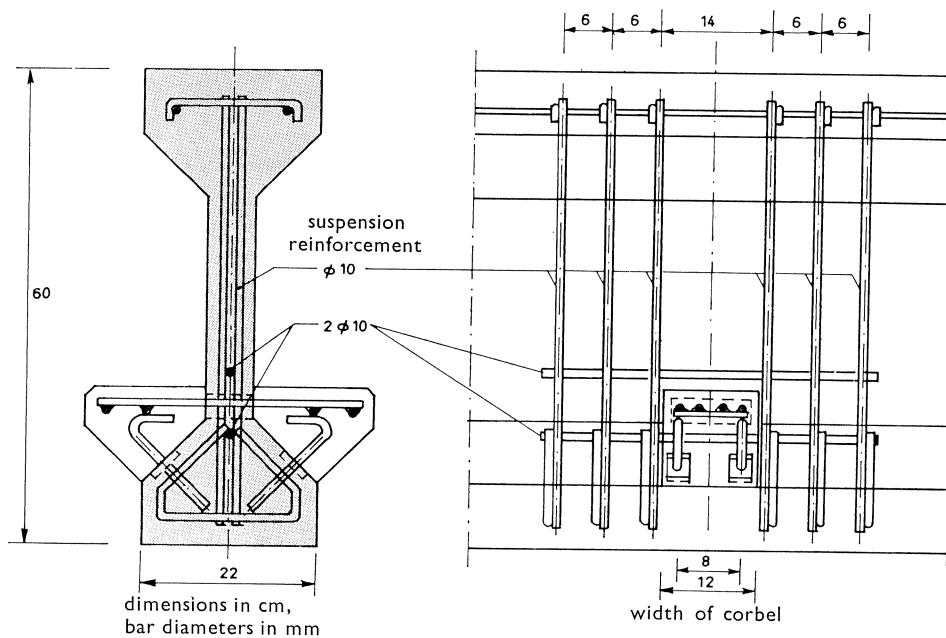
Corbels subsequently cast on to the beam. The corbel reinforcement passes through holes preformed in the web. If there is not sufficient space between the two corbels, as in this case, the suspension reinforcement is installed on each side of them and the bars are connected together.
